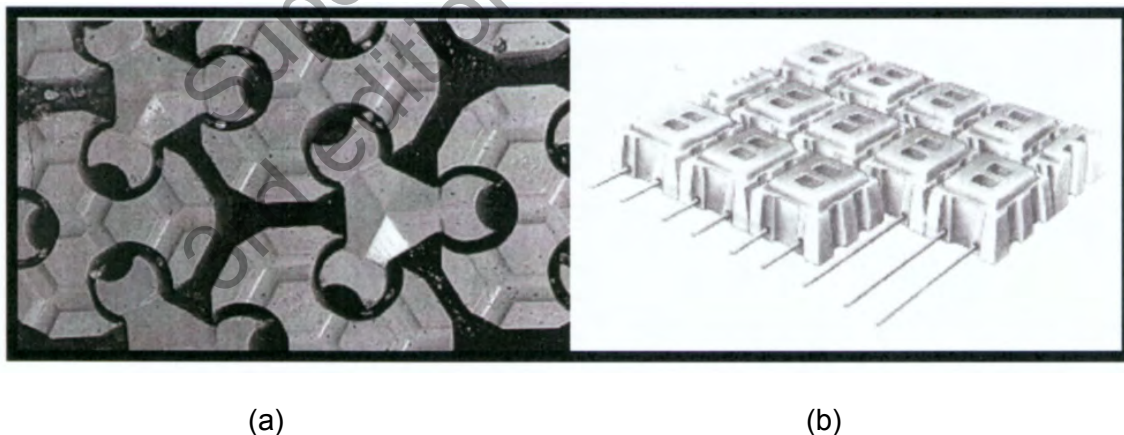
Examples of (a) interlocking block (courtesy American Excelsior) and (b) cable-tied block systems (courtesy Armortec).
